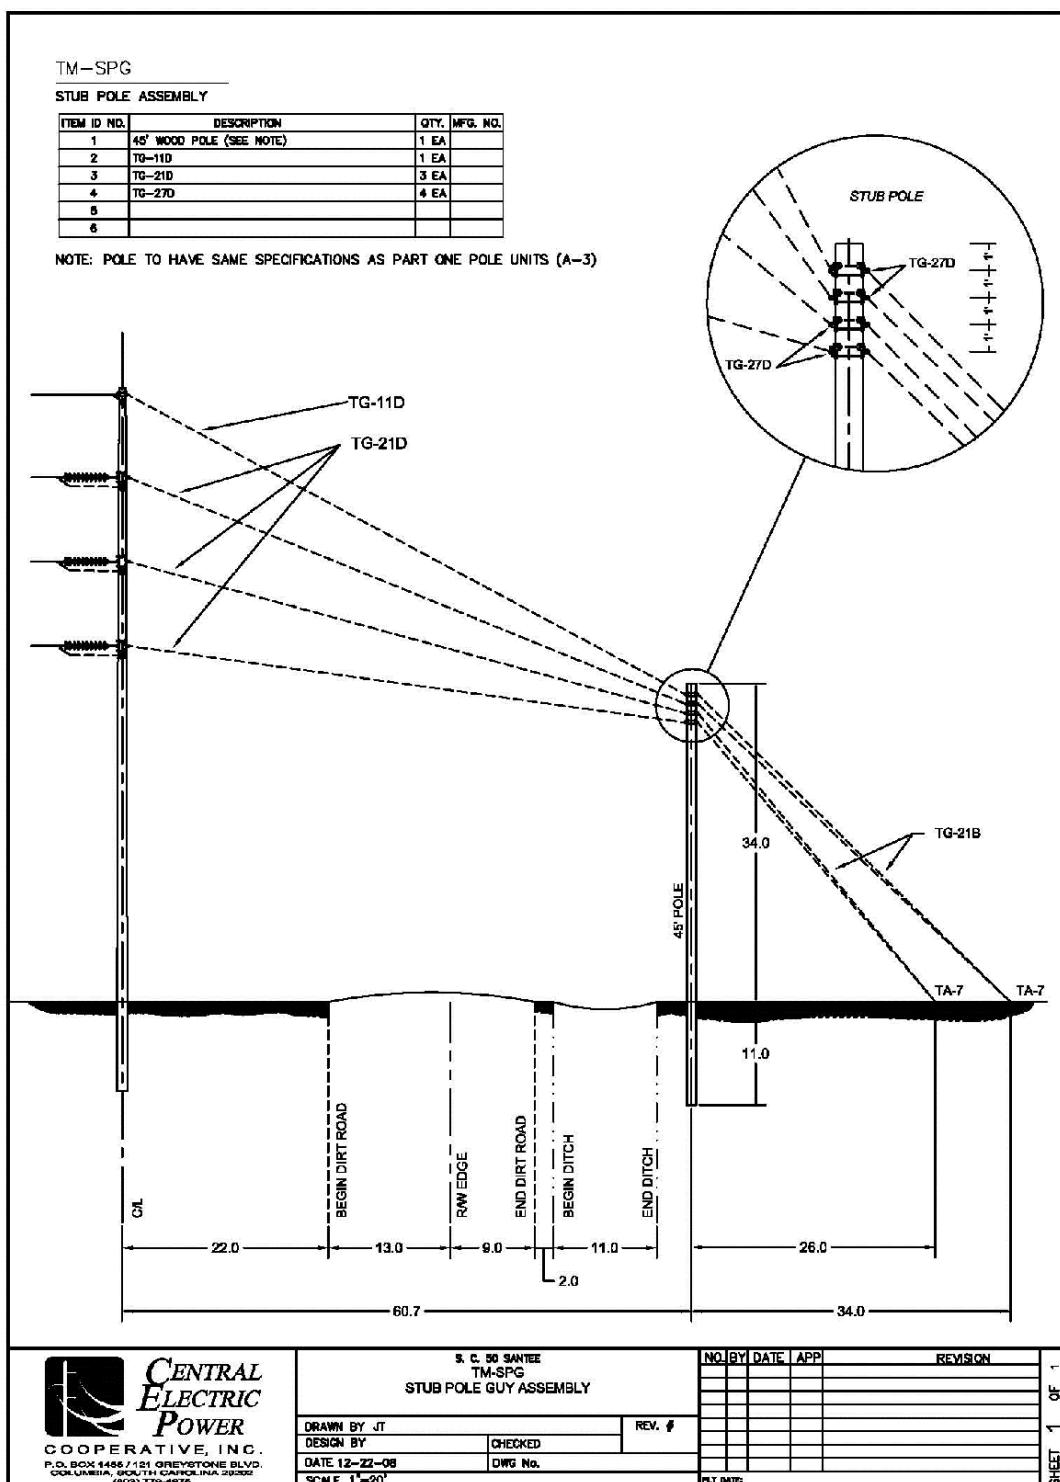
TM-SPG – Stub Pole Guy Assembly
